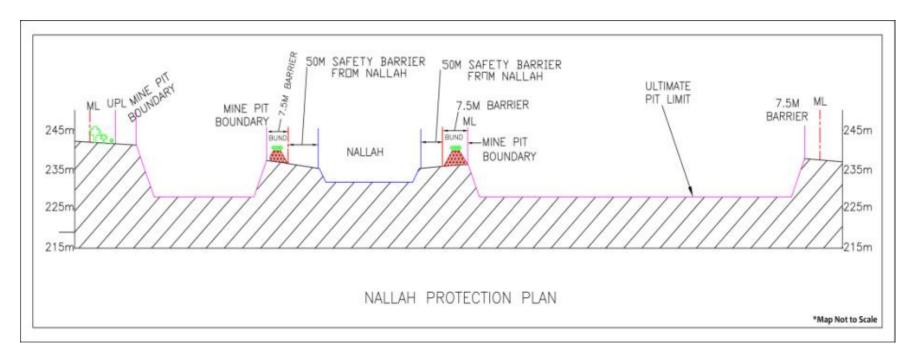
Safety Barriers and Protection Plan for Seasonal Nallahs (Cross Section)
